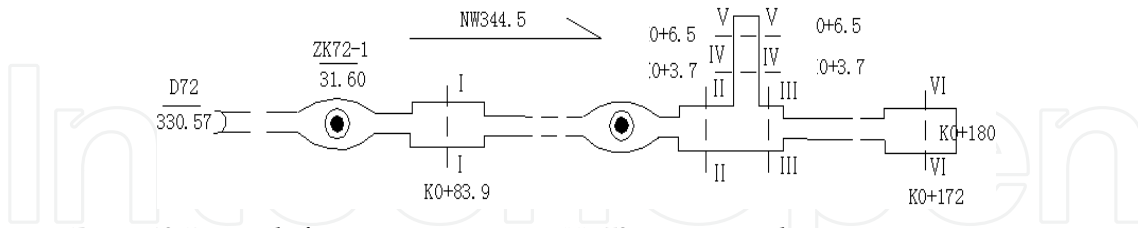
Disposal of monitoring sections at No.72 testing tunnel
